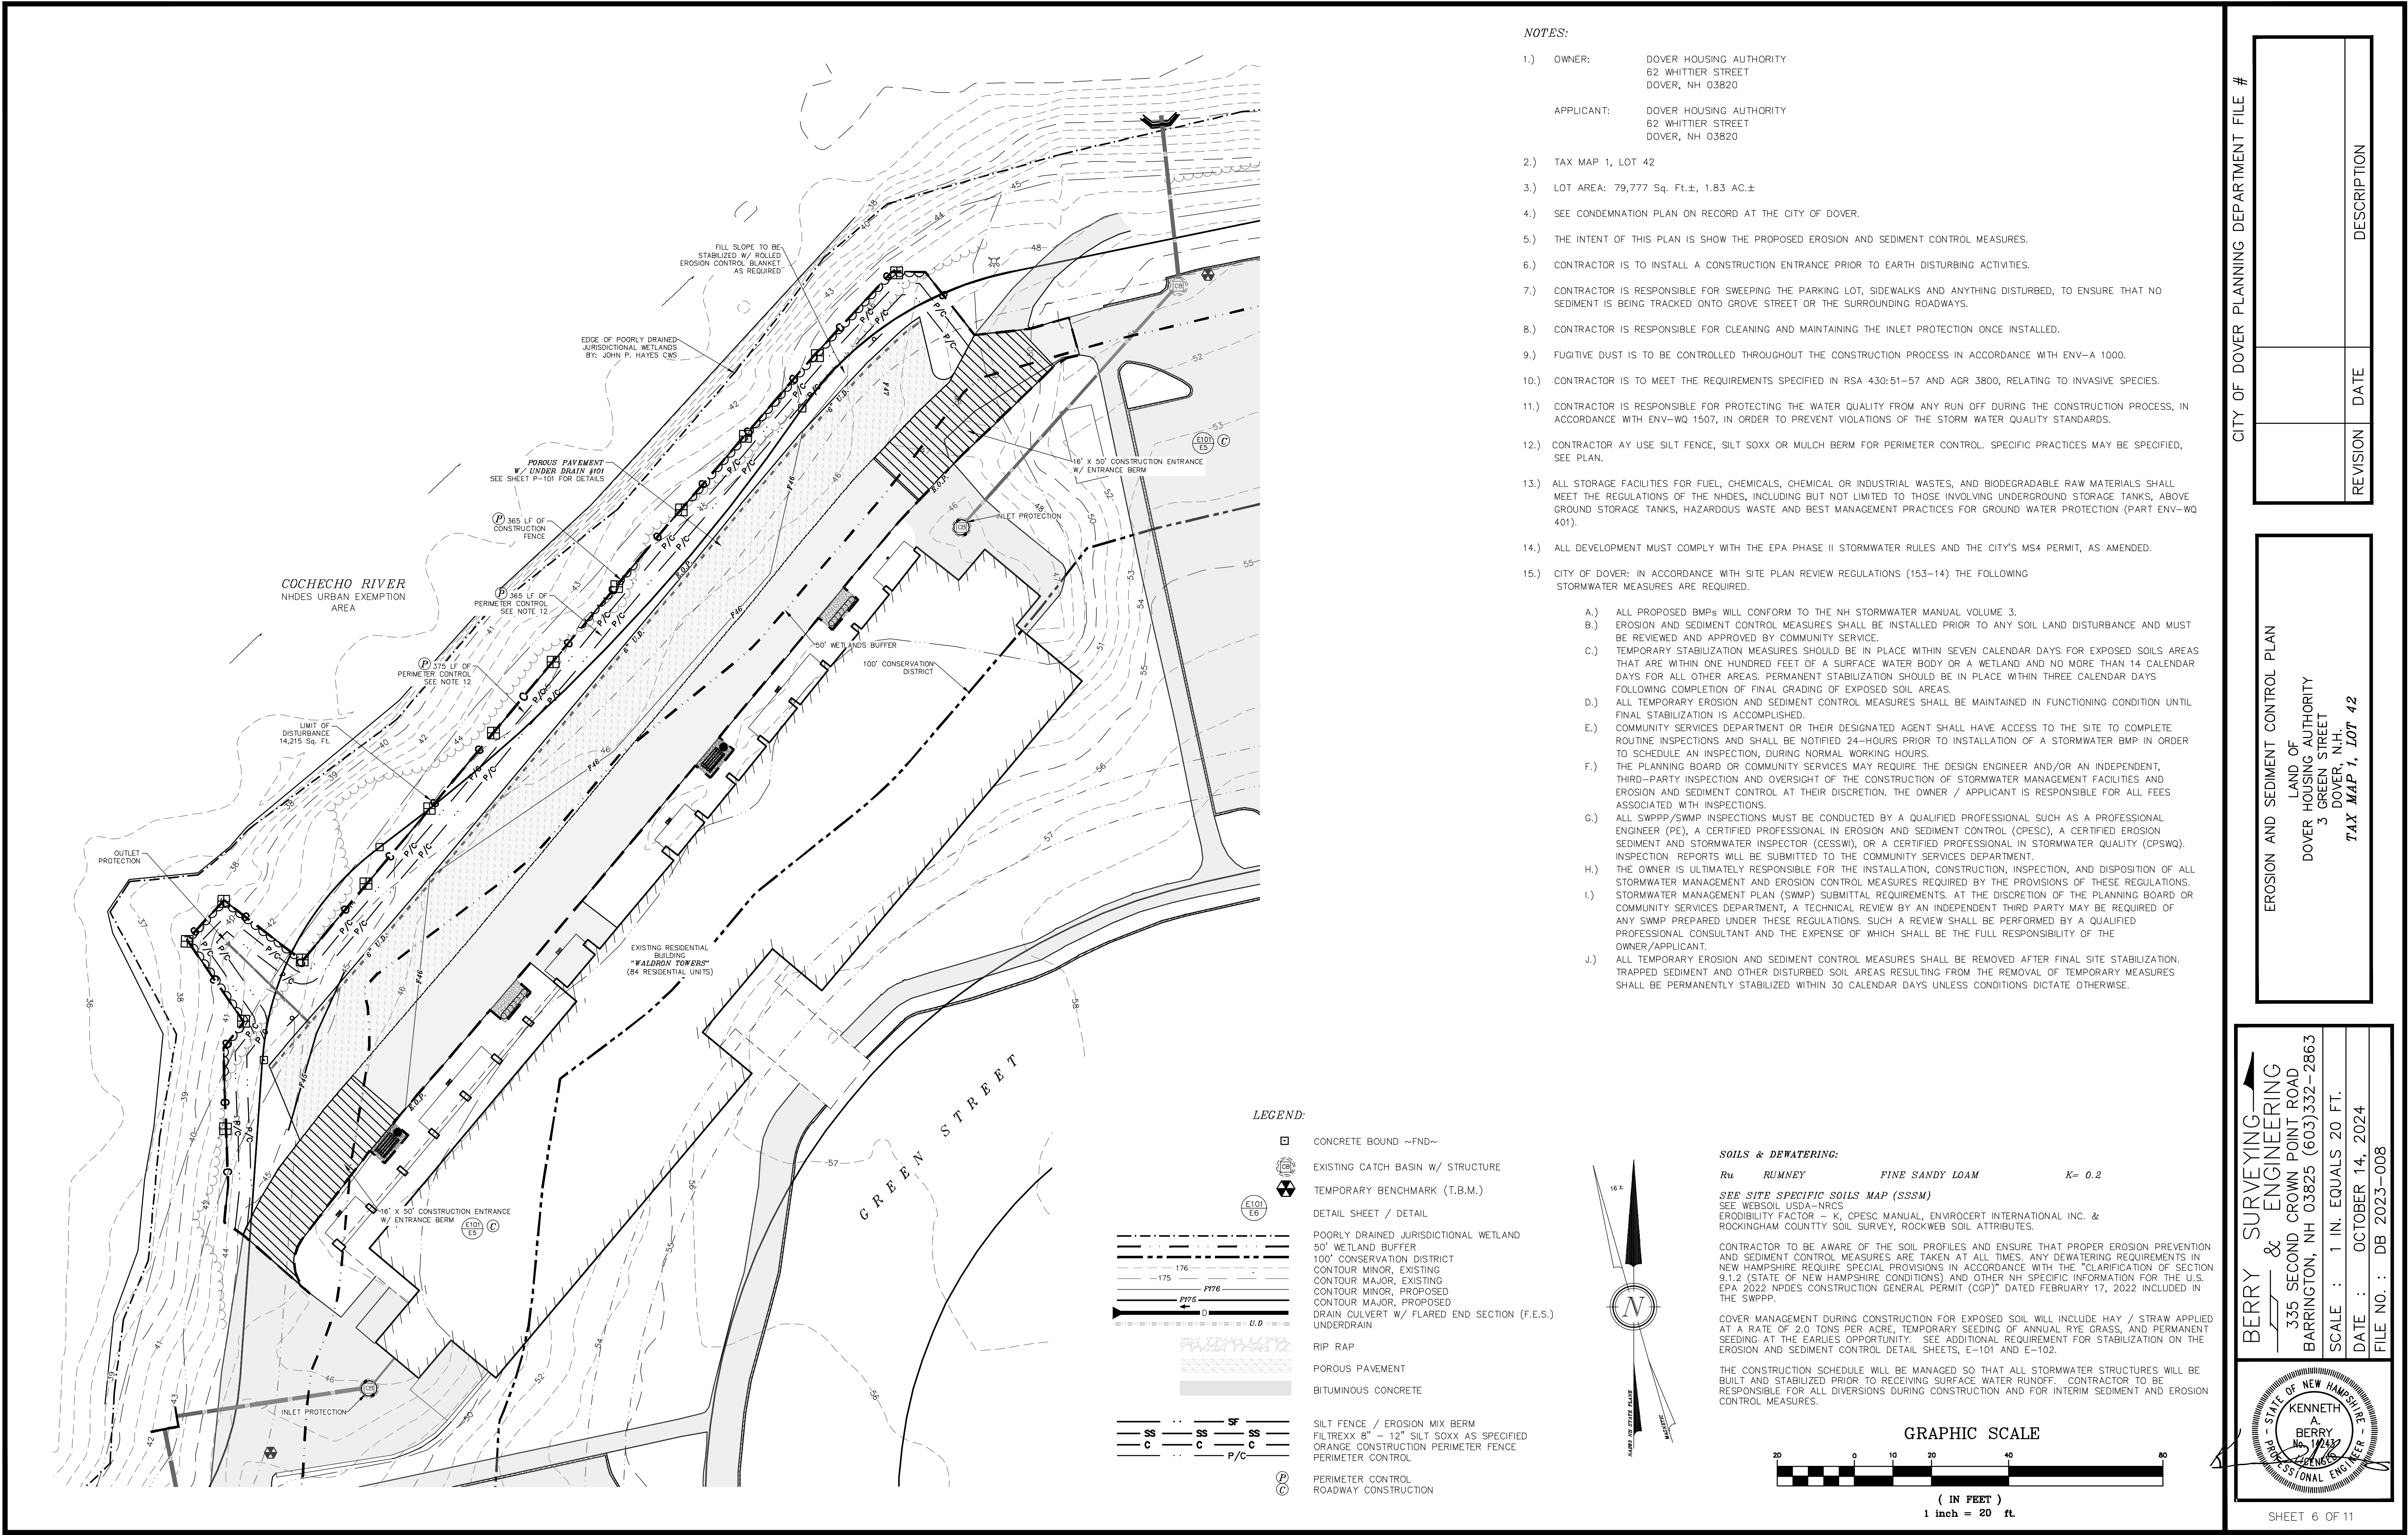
Engineering Design Drawing for Curb Sediment Containment Inlet Protection
